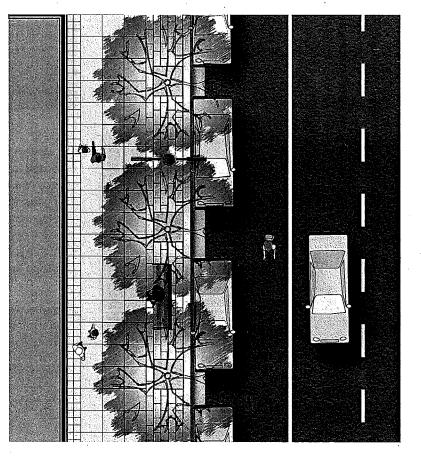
WESTERN EMBARCADERO SIDEWALK PLAN (PROPOSED)
